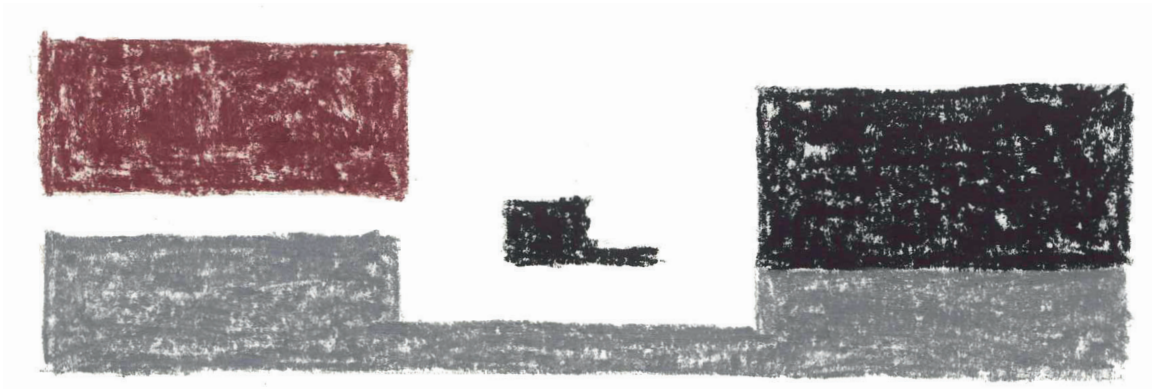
Interventions in plan. Red marks new building. Grey marks reintroduced water.
